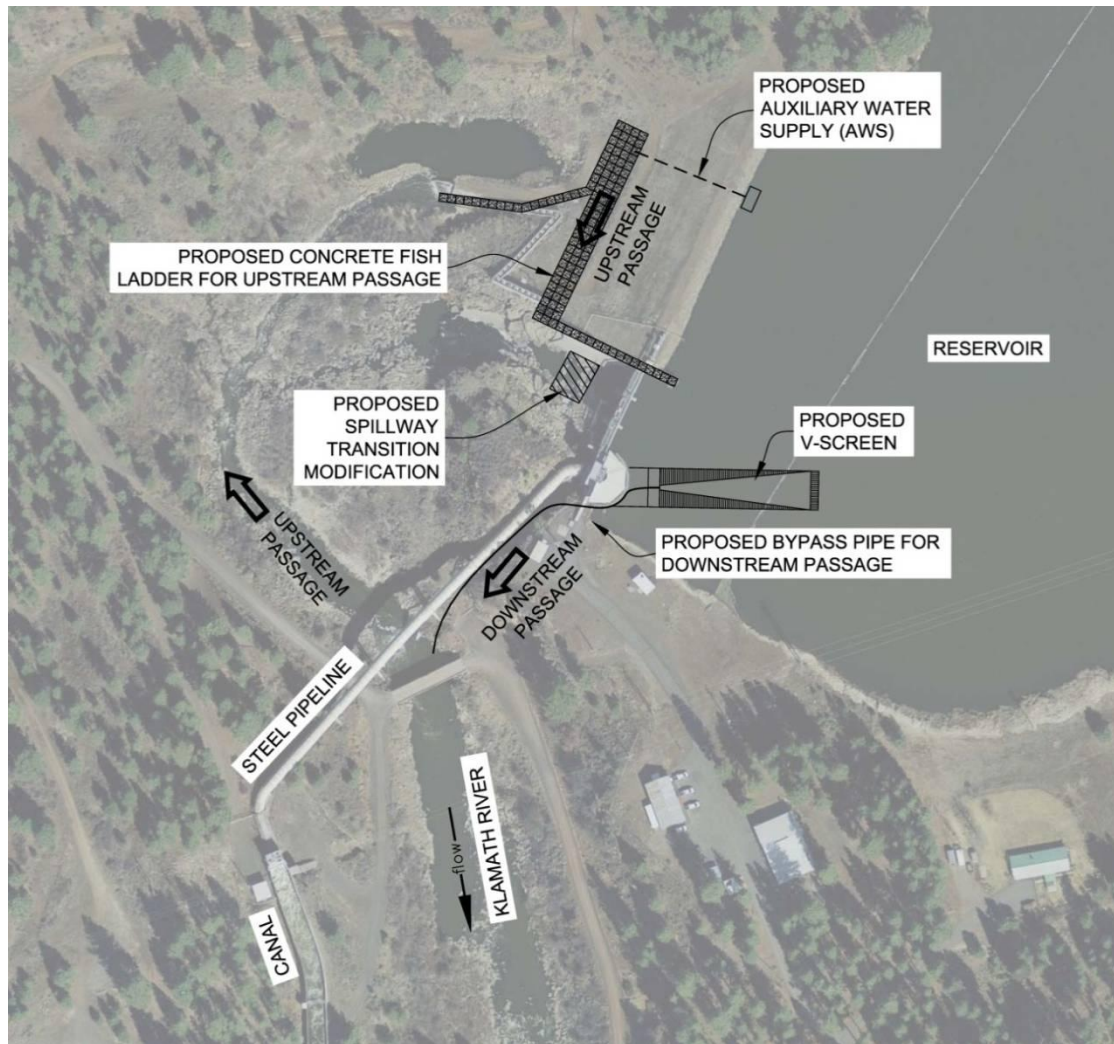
Conceptual Layout of J.C. Boyle Fish Passage Facilities
